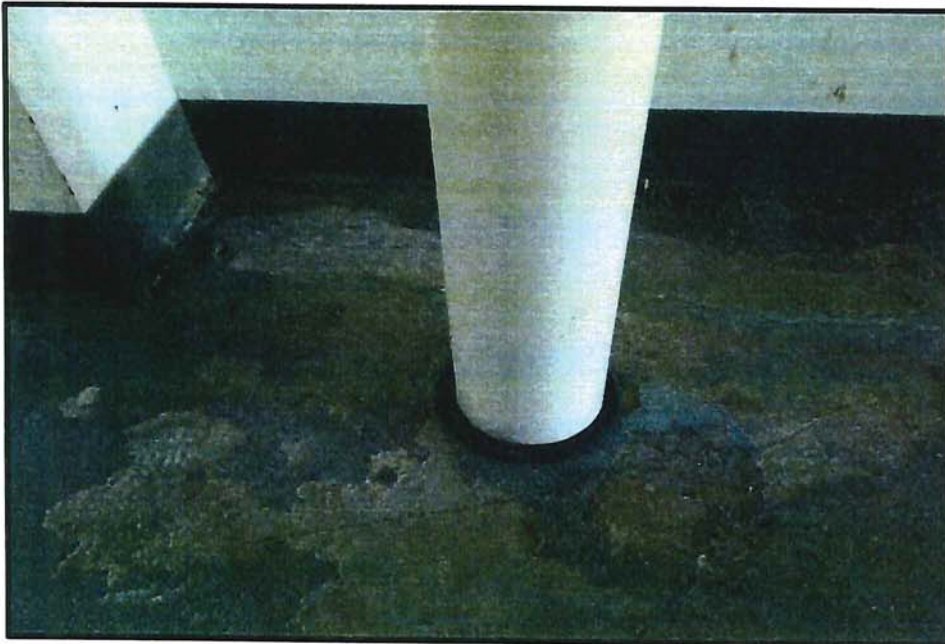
This photograph shows a close up of the floor penetration of the VMS. The floor penetration was sealed with a rubber gasket and caulk. The concrete is approximately 5 to 6 inches thick and approximately 5 inches of sub-slab concrete was removed.
